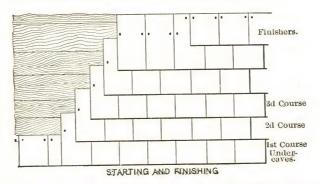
Diagram showing section of slate roof with starting and finishing courses.
